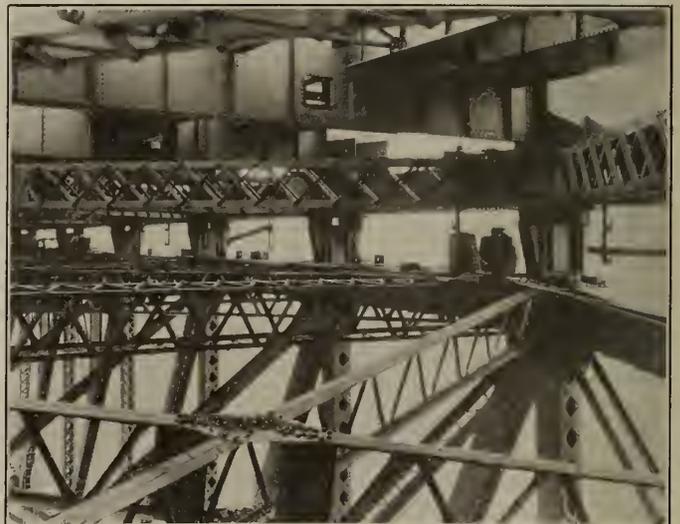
Main Span, South Side—General Arrangement of Pedestals on Falsework Span.
